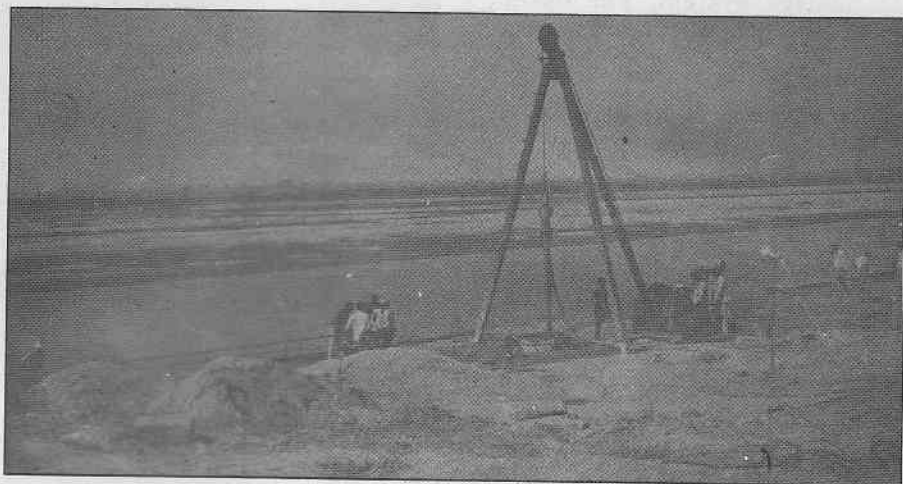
Construction Of Piles By Direct Mud Circulation For New Tower Foundations.
